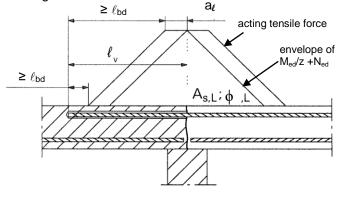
Overlapping joint at a foundation of a wall or column where the rebars are stressed in tension
